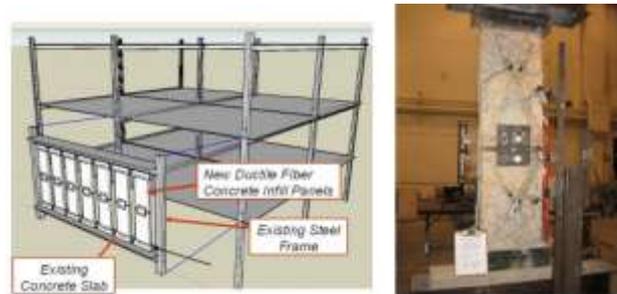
HPFRC infill retrofit system and double infill panel specimen after cyclic testing (Hanson and Billington 2009).
